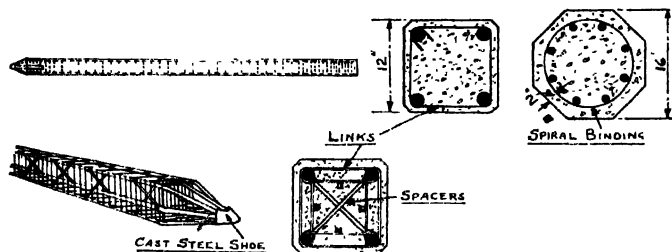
TYPICAL SECTION CONCRETE PILES
